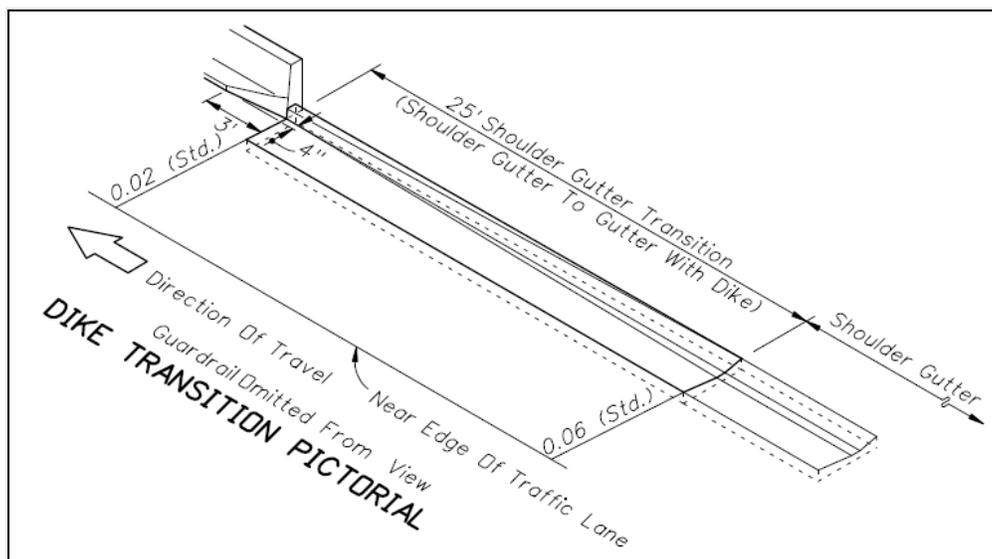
Shoulder Gutter Transition at Bridge End
